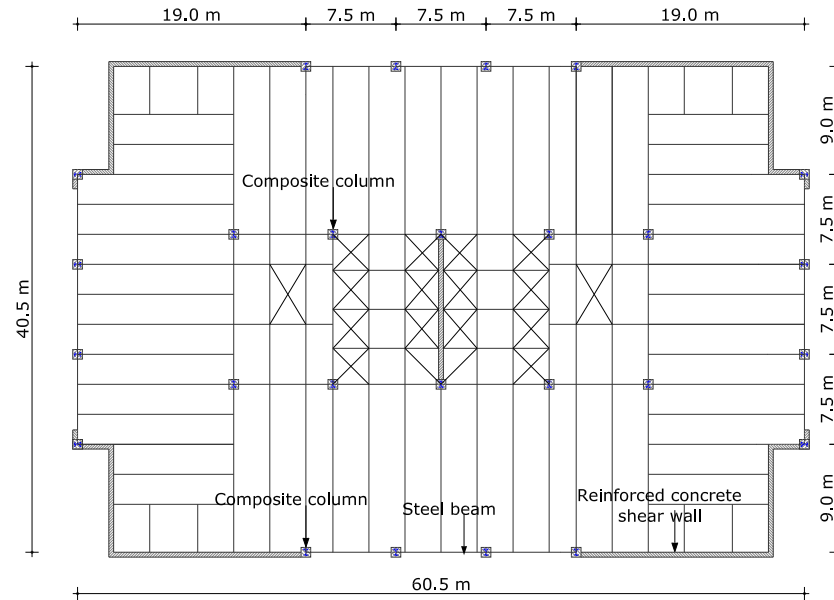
Momentum Place – typical floor plan for levels 30 to 50
